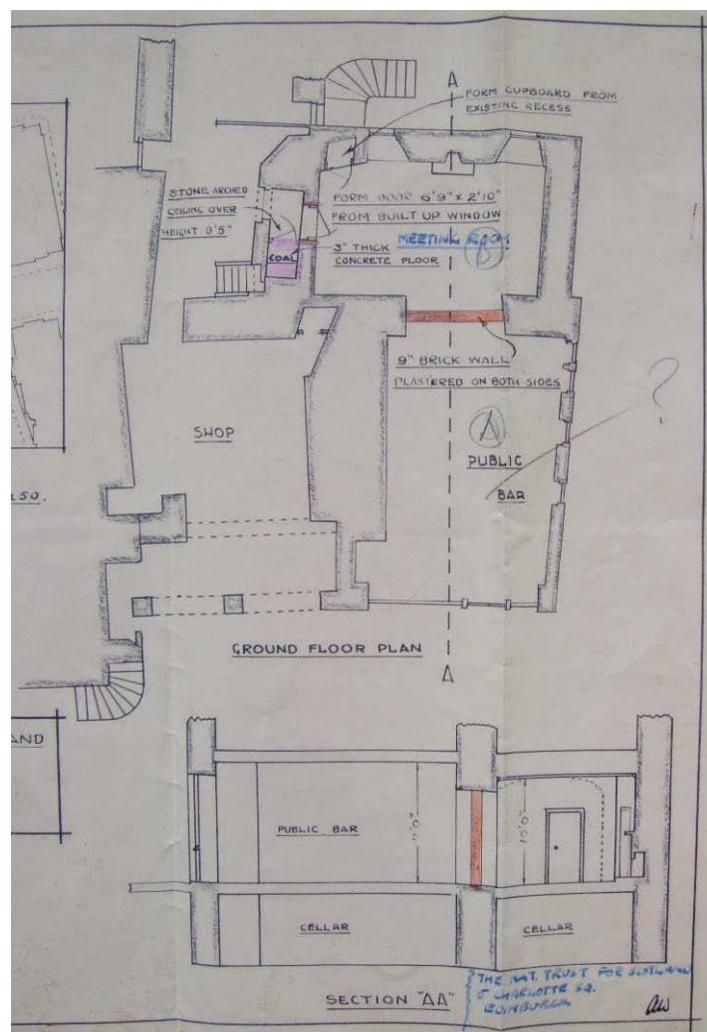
Plan and section showing ground floor of Gladstone's Land and adjacent building to east. Minor alterations warranted 21st March 1958. City of Edinburgh plan store
